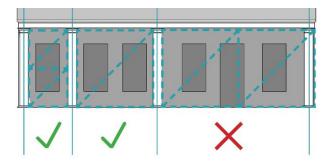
G.4.b: Vertical column spacing. Left, vertically proportioned opening (permitted); center, square opening (permitted); right, horizontally proportioned opening (not permitted).
